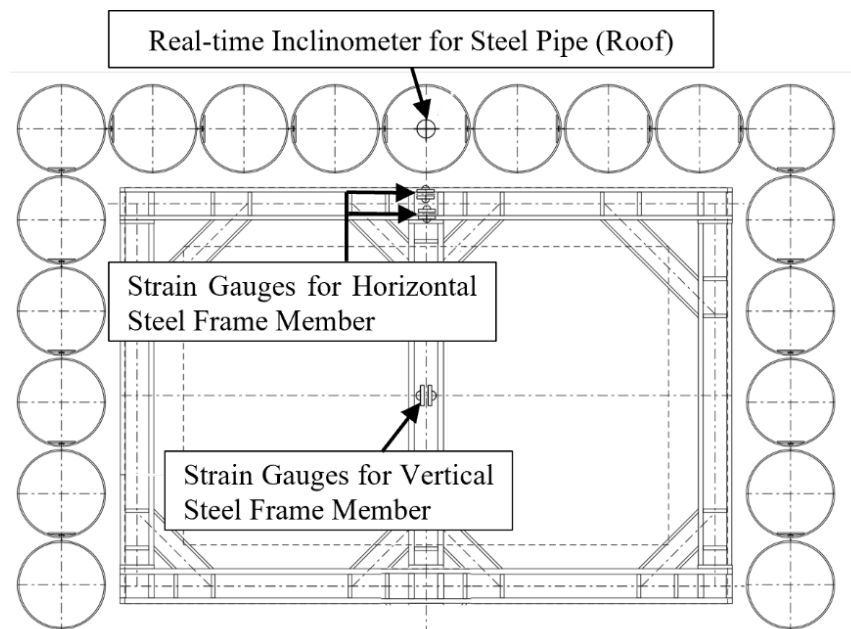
Instrumentation monitoring for steel pipe and steel frame members.
